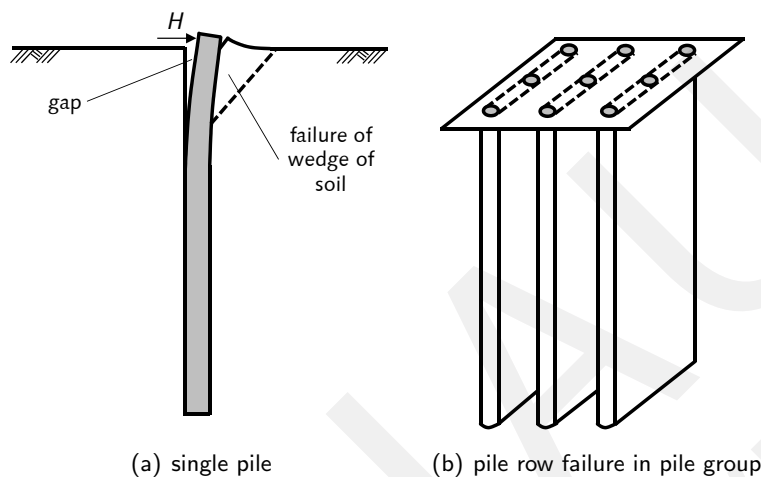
Pile failure mechanism of single piles and pile groups under lateral load, based on [113]
